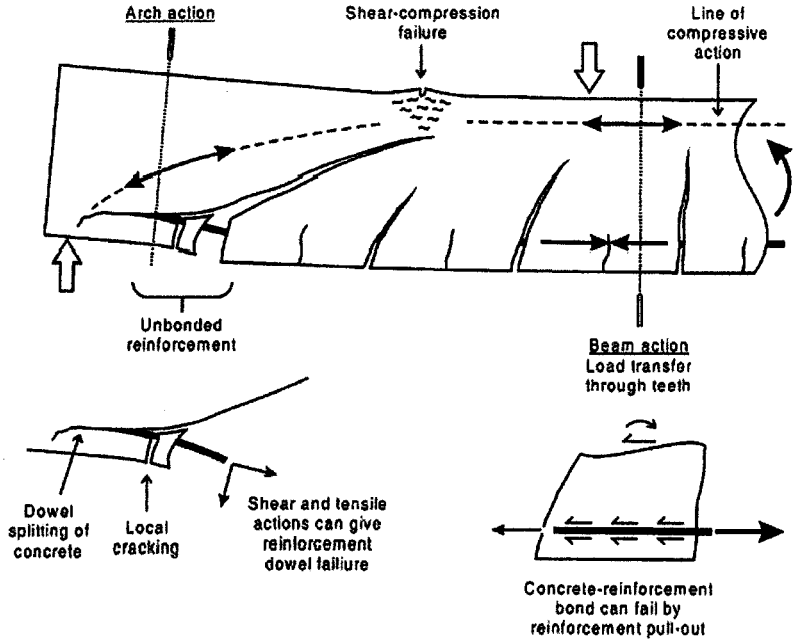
Failure modes in a concrete beam under bending loads [9].
